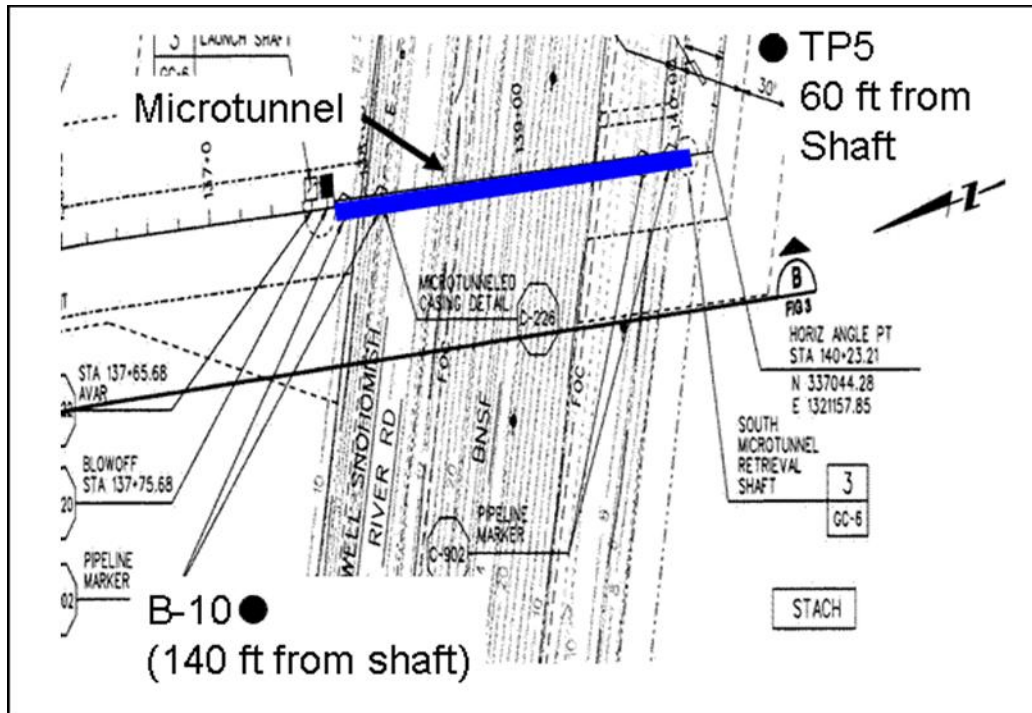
Plan View of Site showing Boring and Test Pit Locations (modified from Montgomery Watson, 2000).
